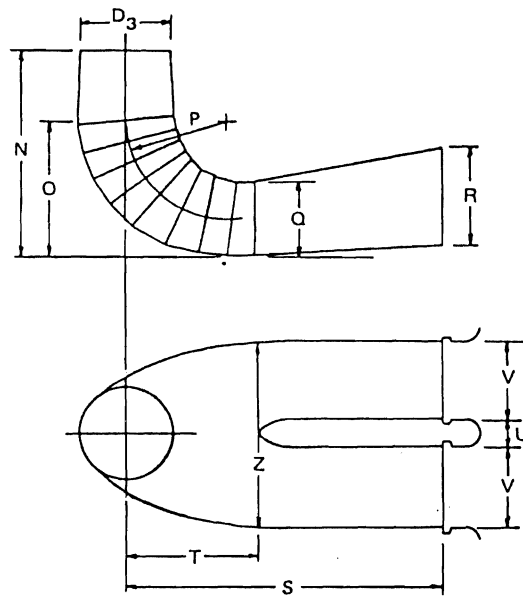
Dimensioning layout for typical draft tube for Francis turbines.
